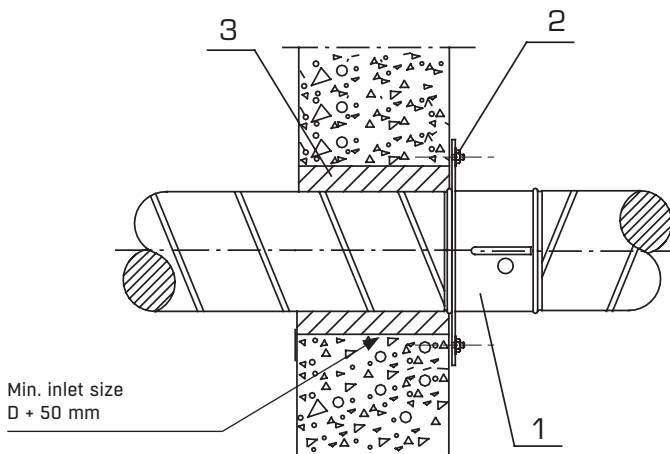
Installation of fire damper into building elements (walls and intermediate floors) made of concrete or masonry, construction thickness  $\geq 110$  mm. The blade shaft can be placed in any position.
